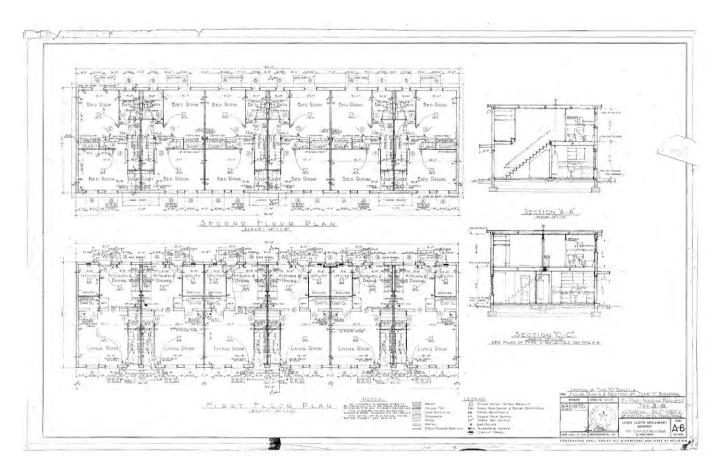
Ray Sherman Place – Original Section of Type "C" Building, Floor Plans & Section of Type "E" Building by Louis Lloyd Mollinary Architect, dated November 1951.
